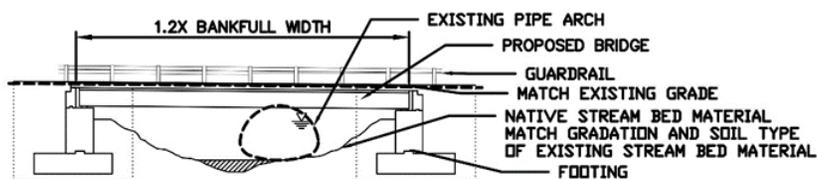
Typical detail of a replacement bridge designed to meet the MA River and Stream Crossing Standards
